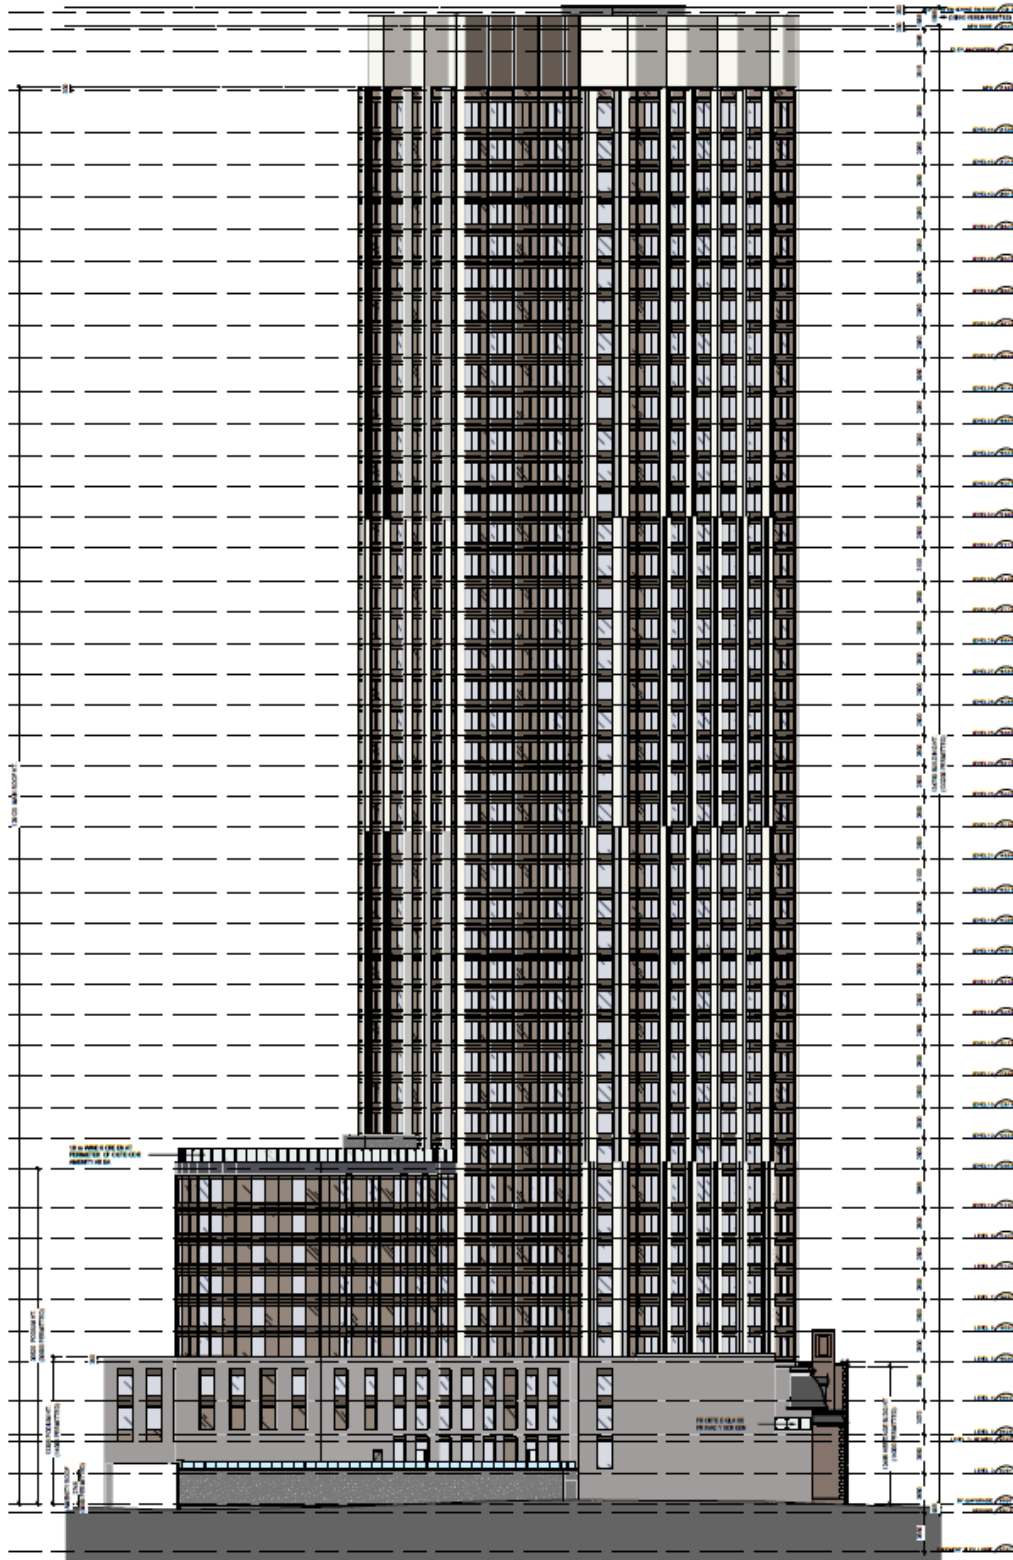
Proposed north elevation of 212 Dundas Street East included for illustration purposes (Rafael & Bigauskas Architects Inc., February 23, 2026).
